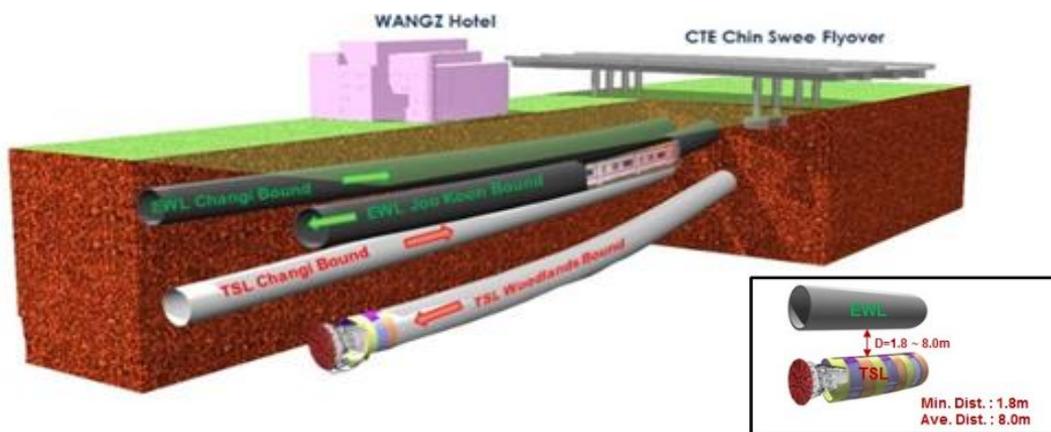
T222 Tunnel drives undercrossing beneath EWL Tunnels
